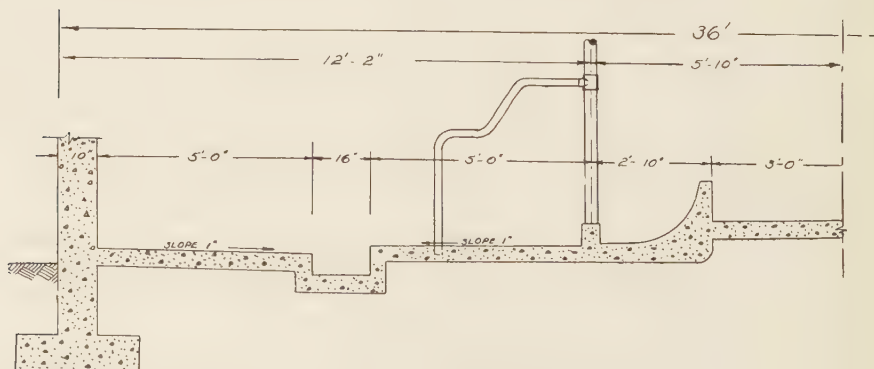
Cross section of a 36-foot barn with "face-in" arrangement.
